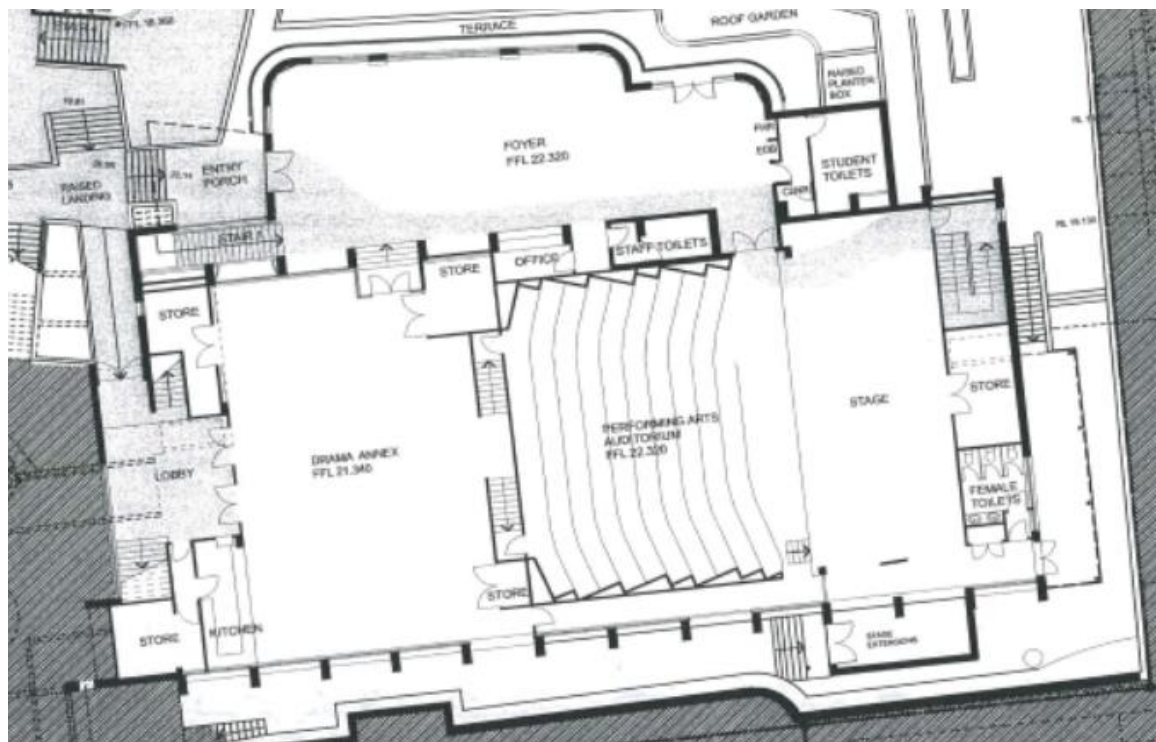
Floor plan of the Mary Ward Building showing the theatre and drama annexe that occupy the space that was originally the multipurpose hall. This floor plan is largely consistent with the current plan of the building. (Source: Loreto Master Plan, Plan Level C, drawing 09023_108A, Gardner Wetherill & Associates, 2011)
